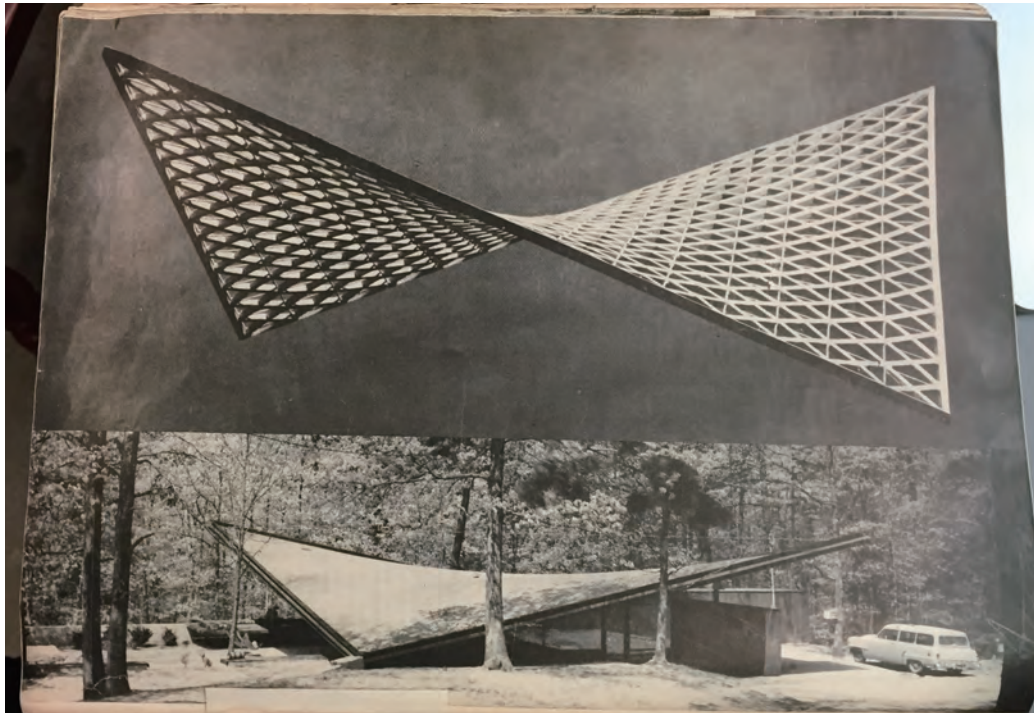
Eduardo Catalano's hyperbolic paraboloid. Source: *Architectural Forum*, November 1955
